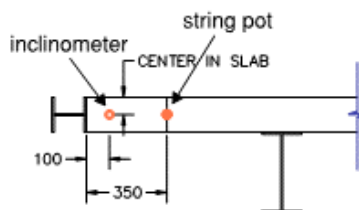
Typical inclinometer and string potentiometer locations on south and north slab elevation
